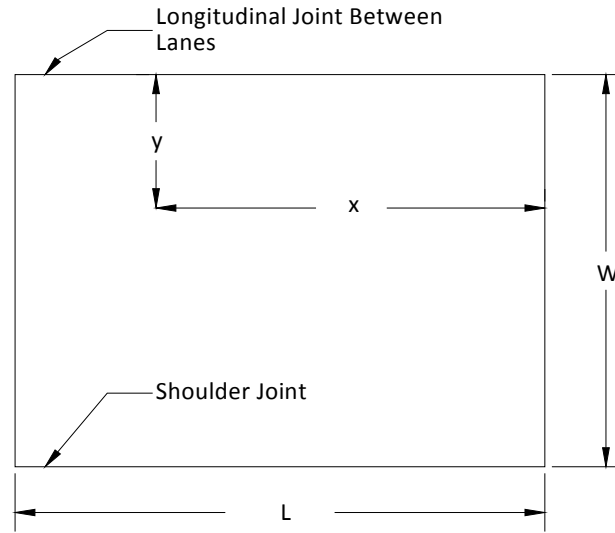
Instrumentation plan and dimensions for a typical section on I86 (1 m = 3.28 ft).
